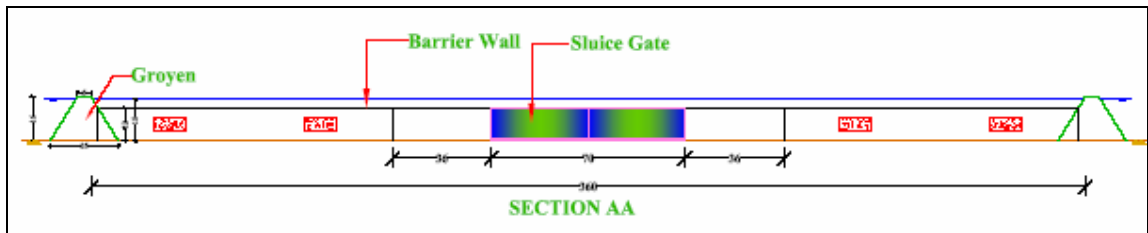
Underwater barrage between two training walls of 2000 m long and 360 wide barrage
